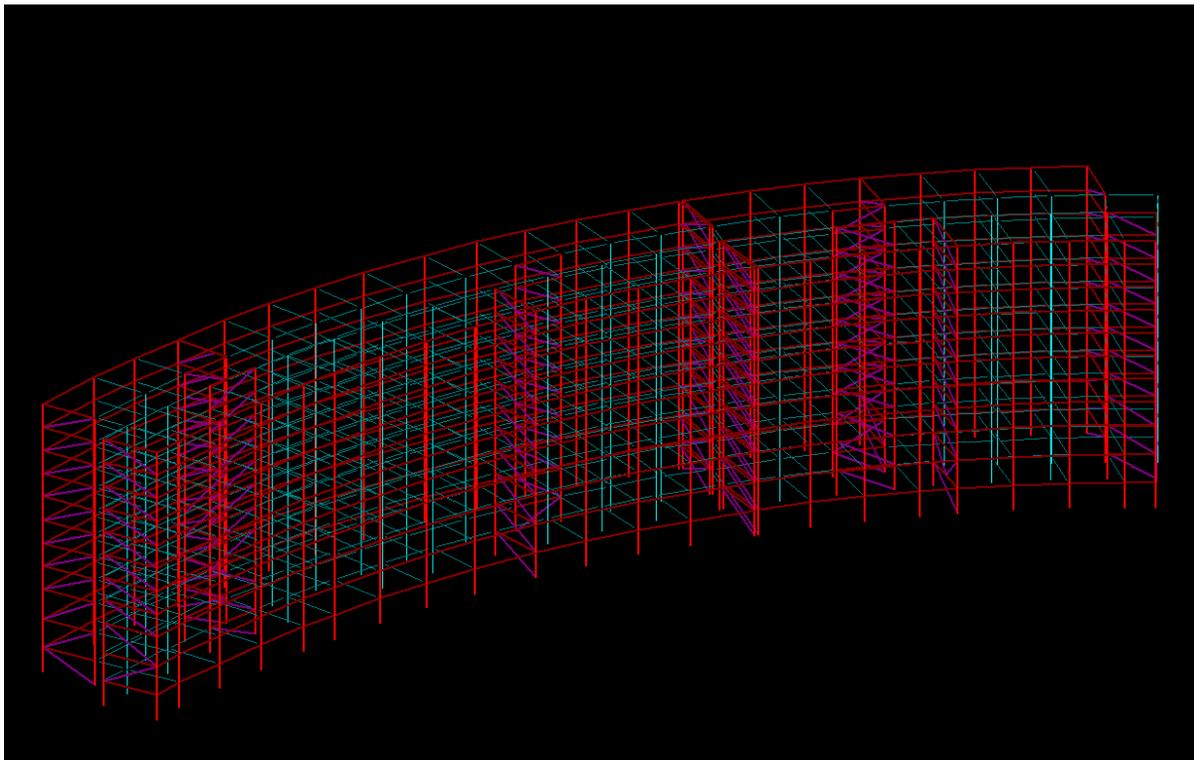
New Hospital modeled in RAM Structural System. Note the expansion joint near the middle.
